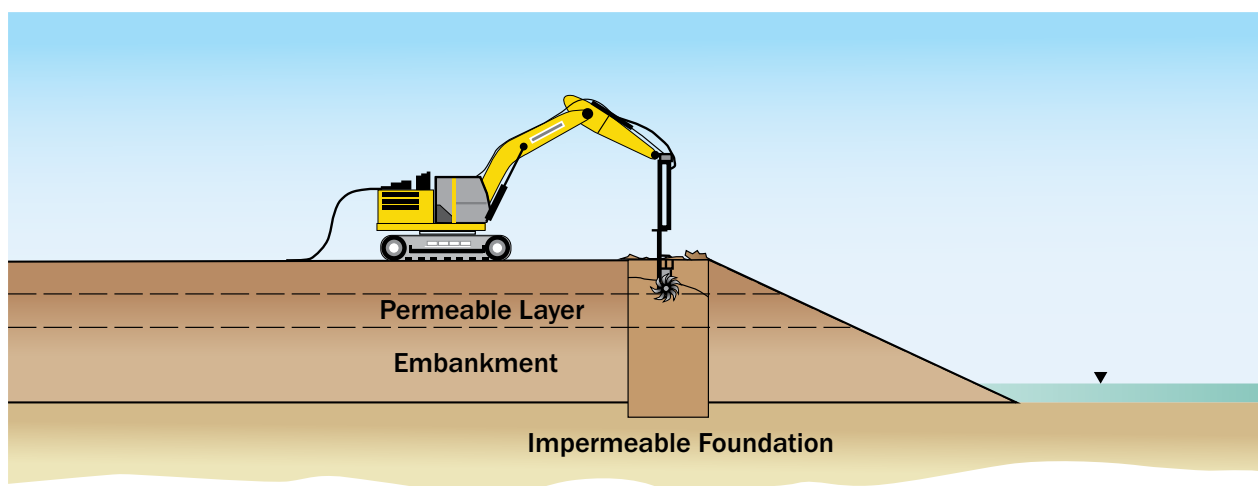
Seepage cutoff walls can be achieved through deep soil mixing.
